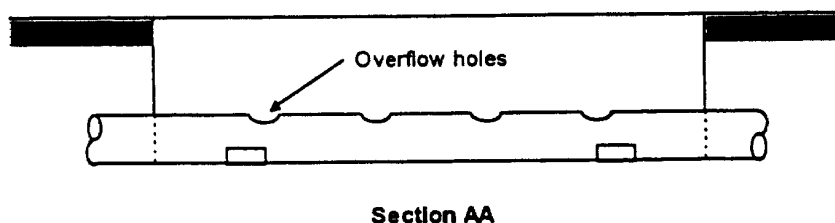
Schematic of detention facility low-flow bypass structure.
